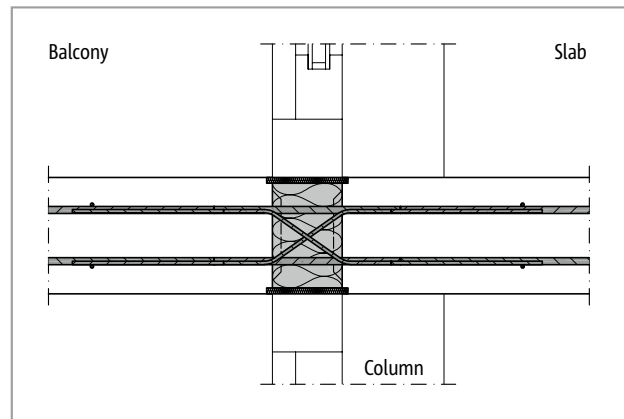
Schöck Isokorb® XT type D: Two-way spanning
